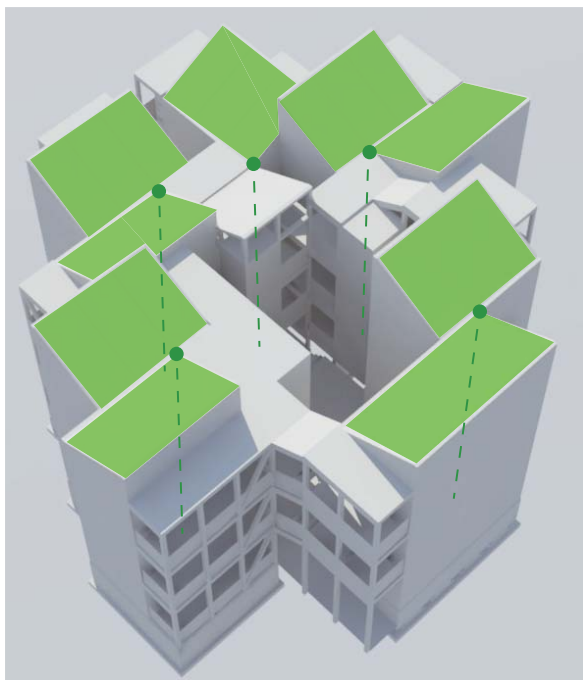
Rainwater catchment roof surfaces and vertical drainage
